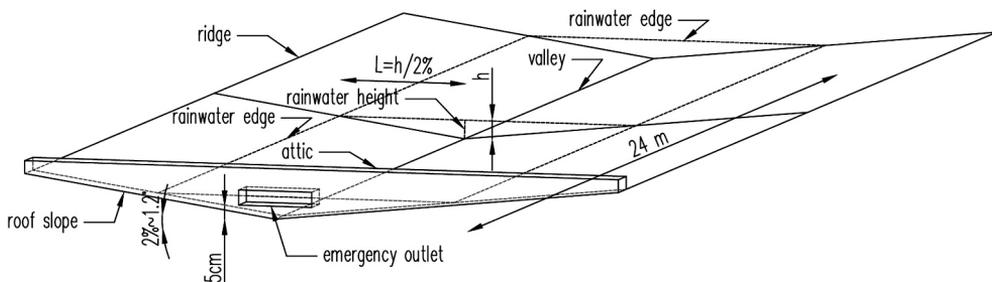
Geometry of a typical flat roof's last span with rainwater height equal to h
